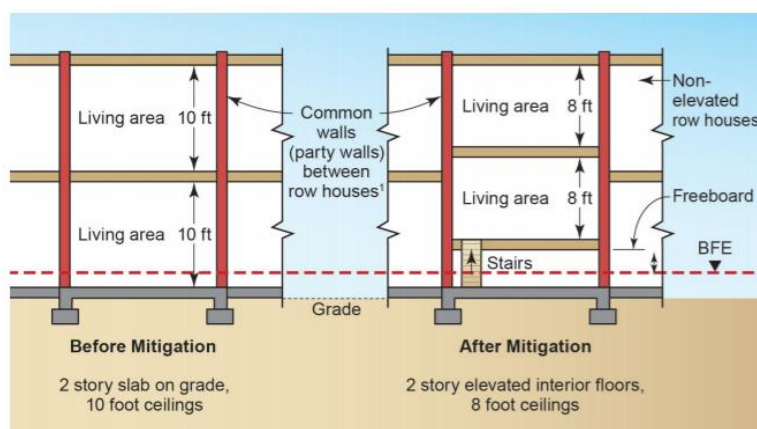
Elevating the lowest floor involves lowering the height of all rooms (FEMA, 2015)
